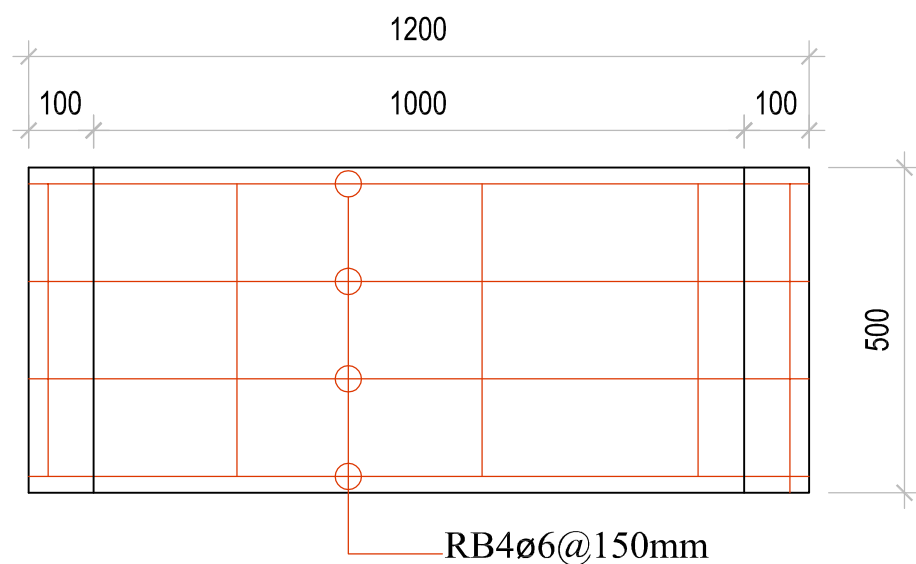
DETAIL REINFORCEMENT FOR RC PIPE AND COVER
